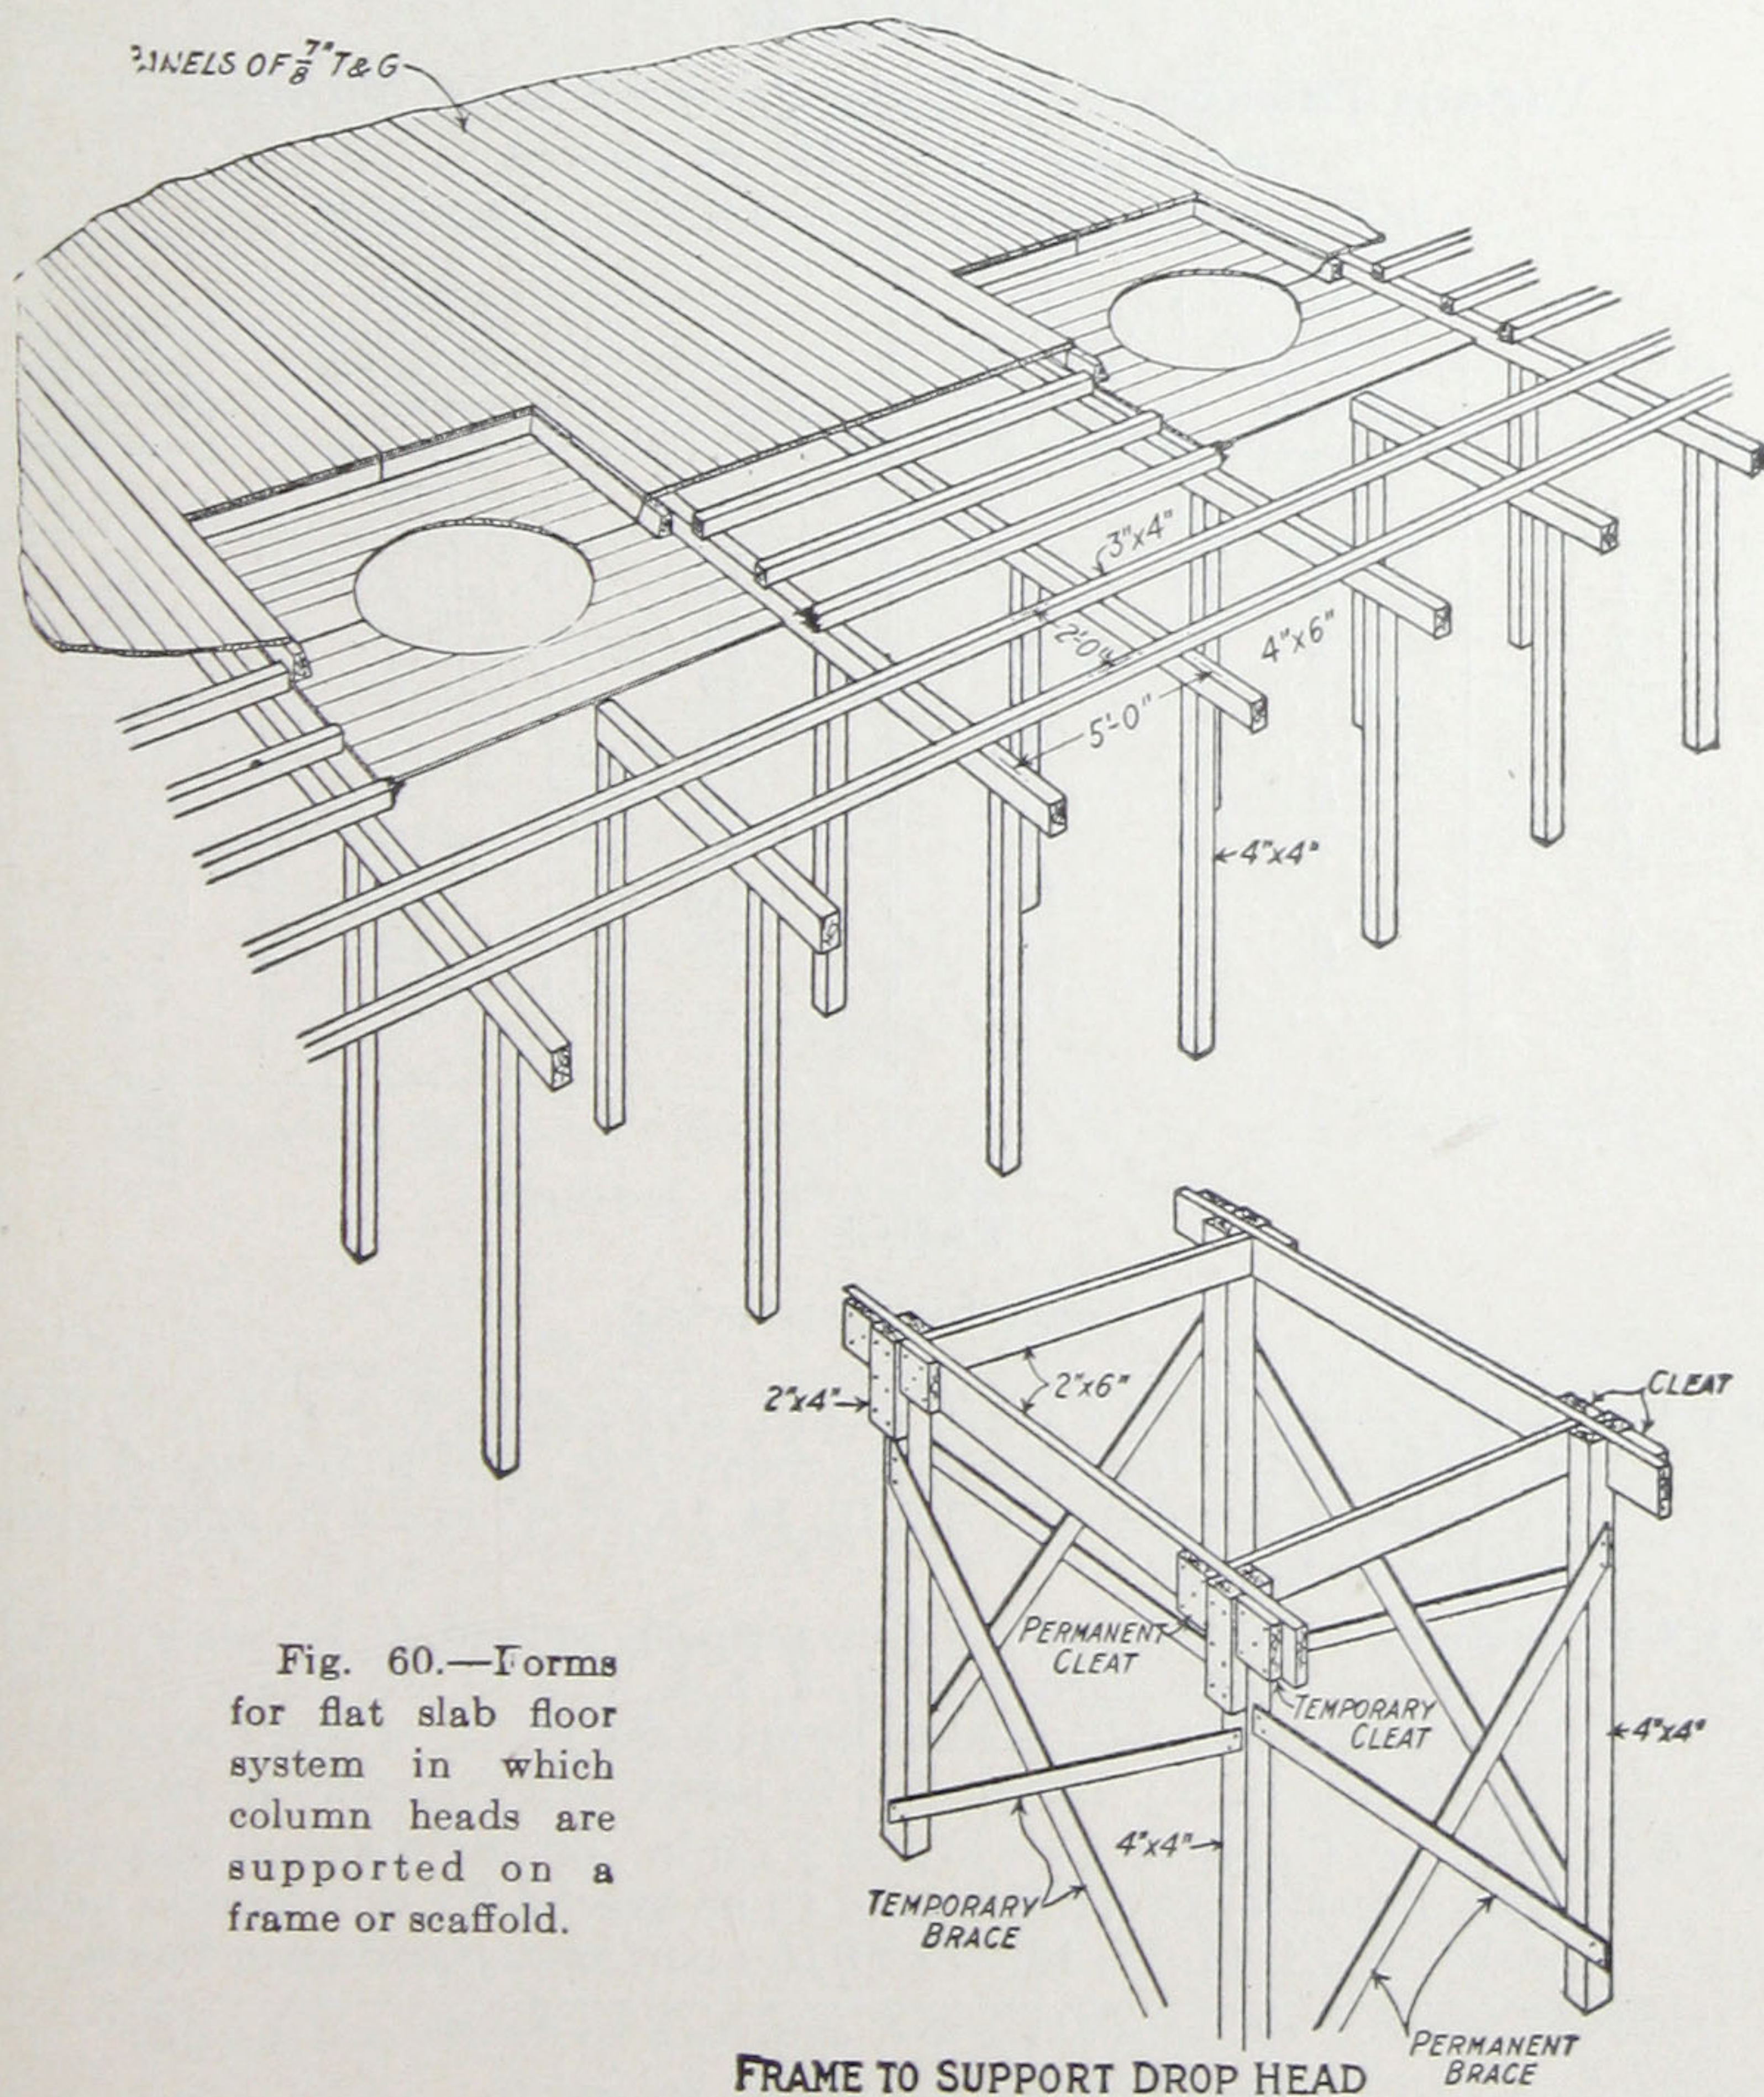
Forms for flat slab floor system in which column heads are supported on a frame or scaffold.
